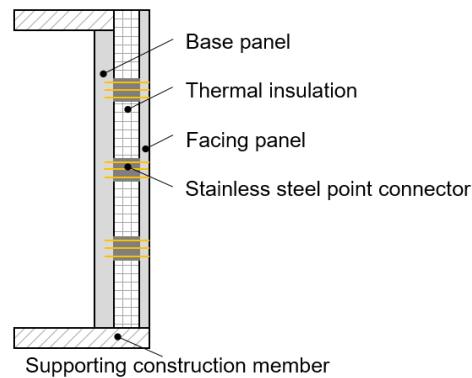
Cross section of a sandwich wall, assembled with stainless-steel point connectors; without gap between thermal insulation layer and base panel
